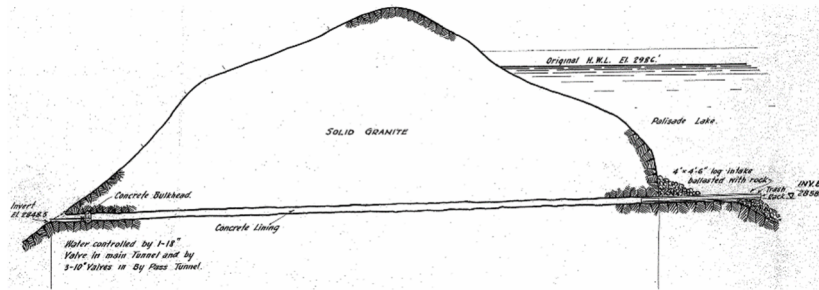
Section through the discharge tunnel at Palisade Lake
